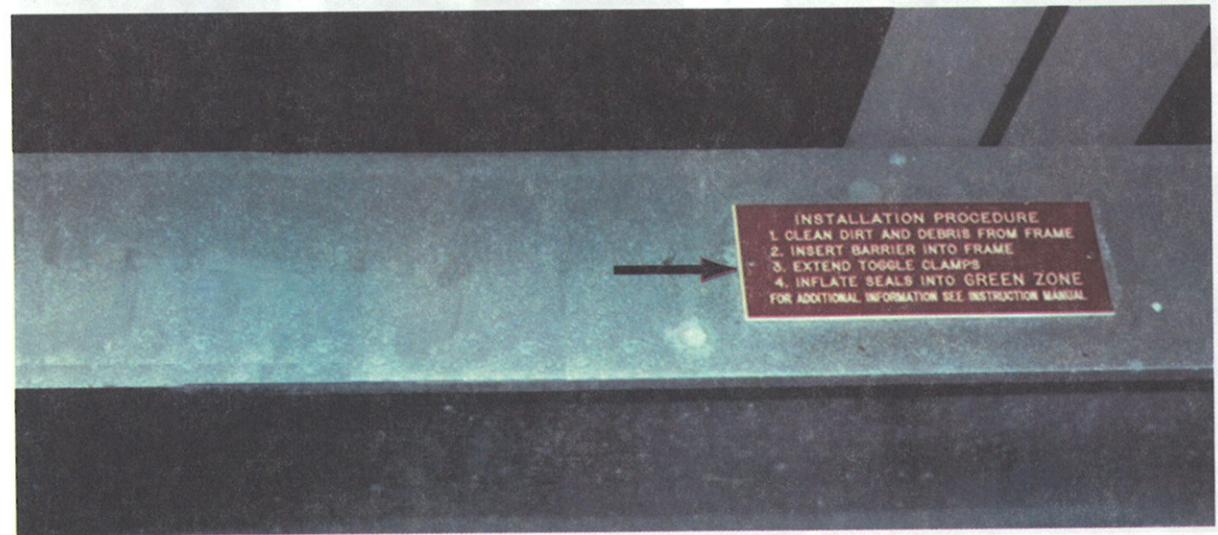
Dry floodproofing often requires extensive human intervention. Note the detailed instructions affixed to this flood shield.
